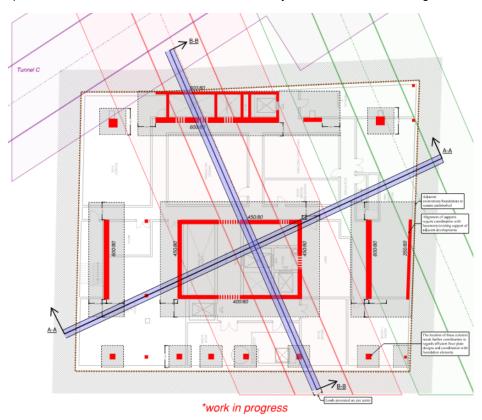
Proposed 2D analyses sections for Metro West tunnels
